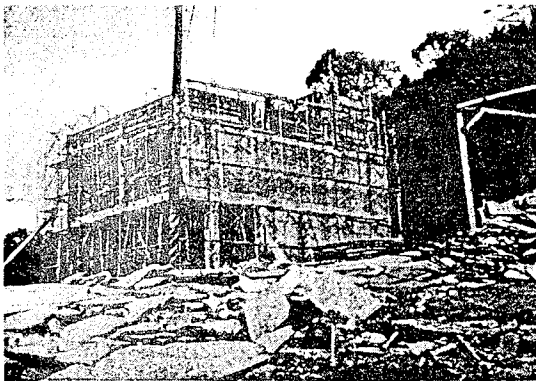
The low-rise building (Fengyuan City, Taichung County)
